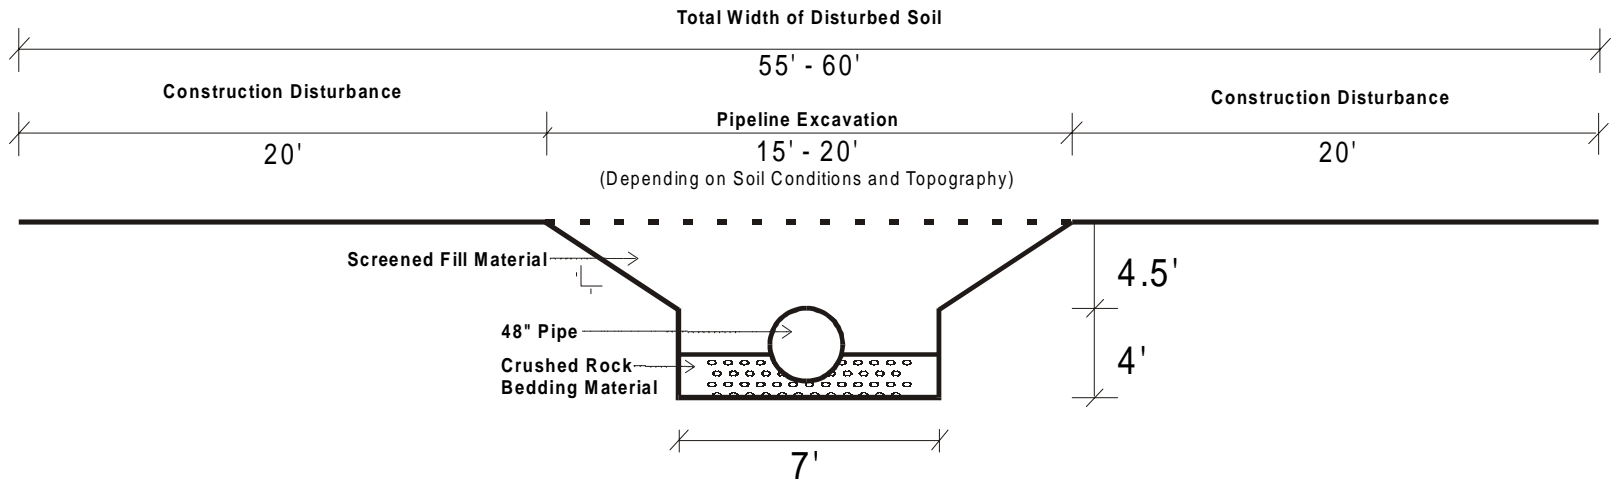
Buried Pipeline Alternative, Typical Cross Section
